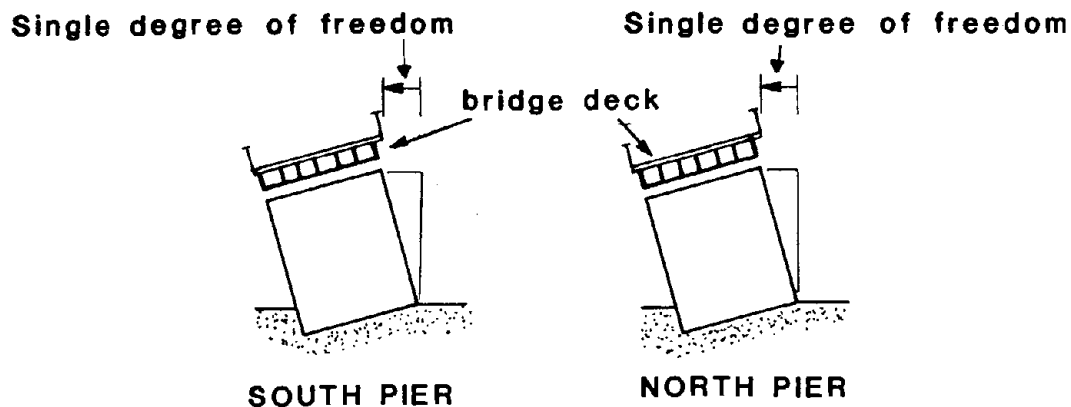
Triple simple span bridge. Lateral rocking distortions of north and south piers (assuming foundation material is flexible relative to piers).
